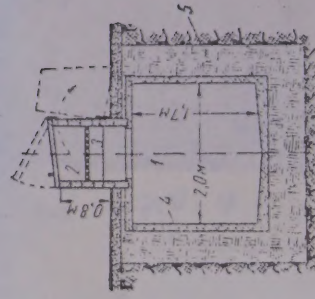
Outdoor Waste Pit; 1. Cesspit; 2. Upper Ringed Section; 3. Screens for Retaining Large Objects; 4. Concrete Wall; 5. Clay.
